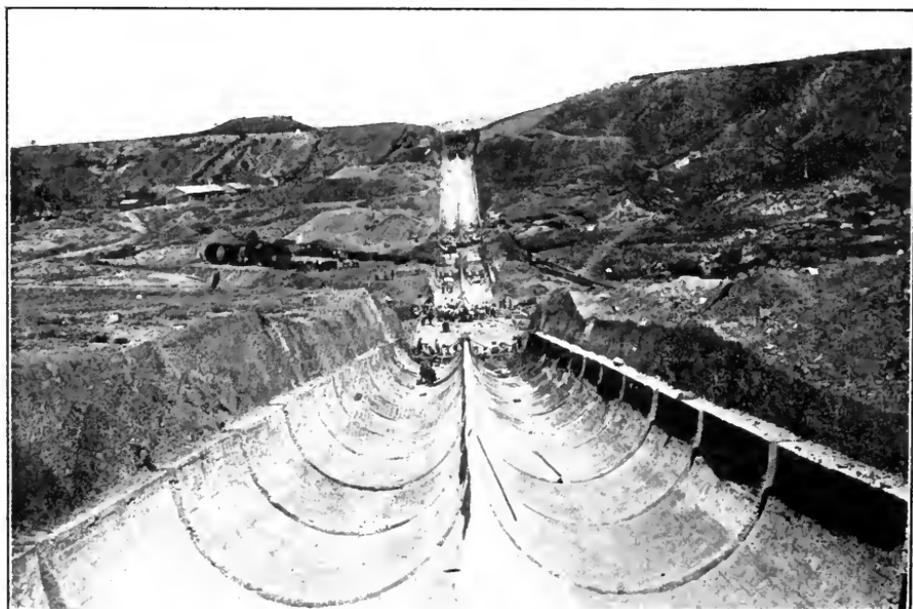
FIG. D.—Cradles of lean concrete to support reinforced concrete pipes of Sosa Siphon, Spain.
